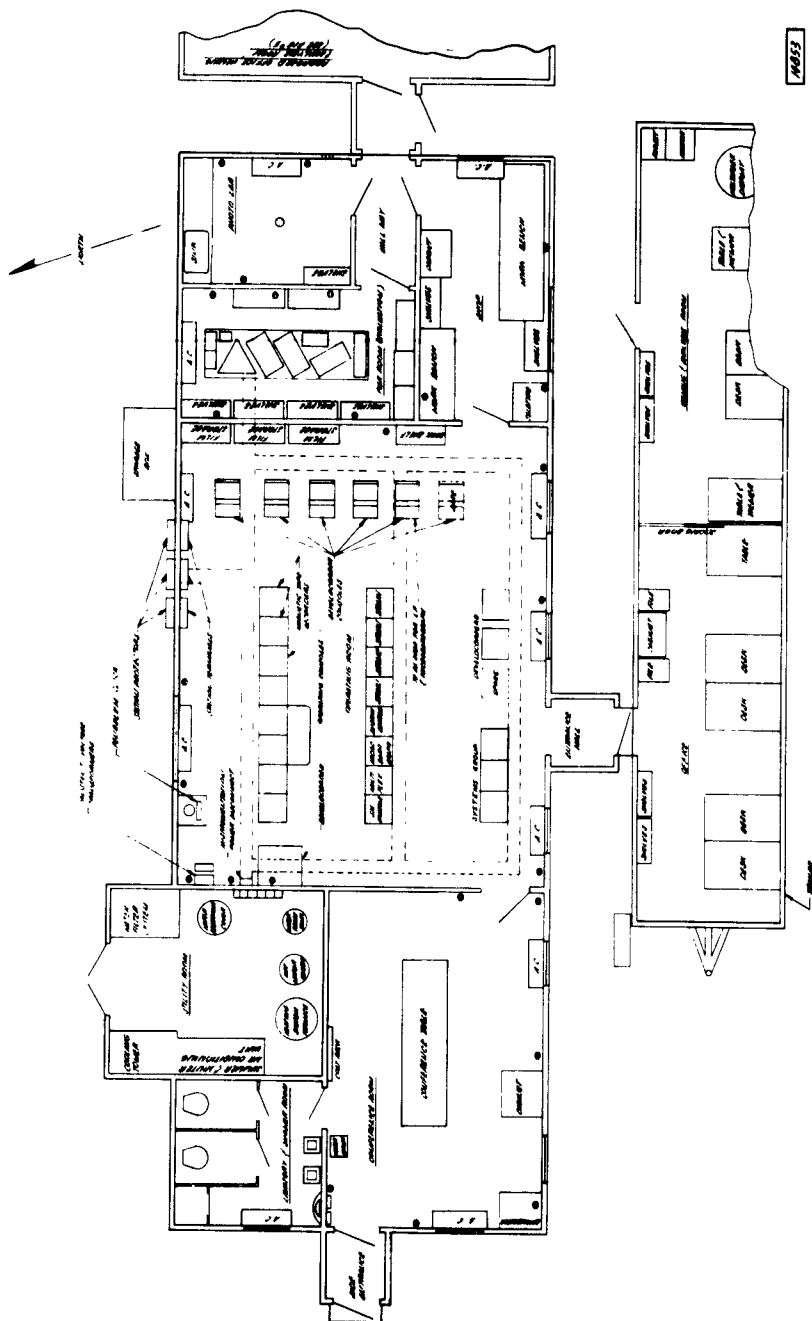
Floor plan of the central-recording building and trailer annex at WMSO after modification of the operating room
